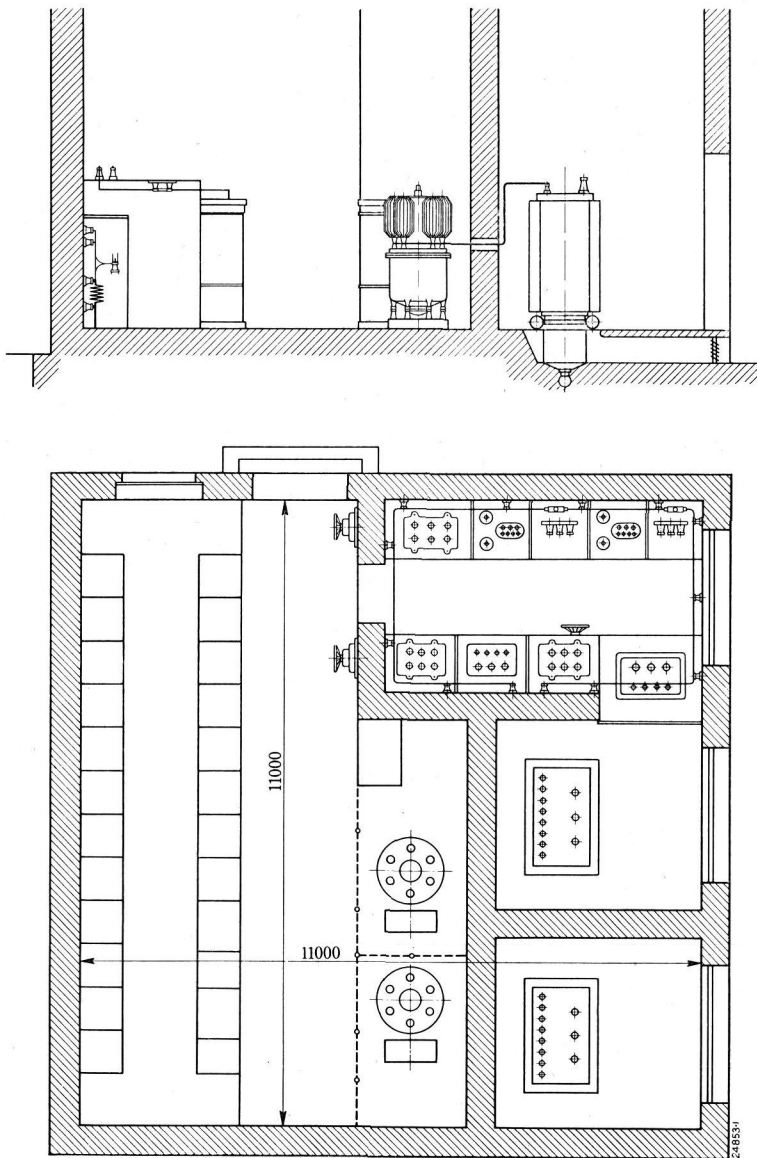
Plan and elevation of Sebrowitz Substation.
